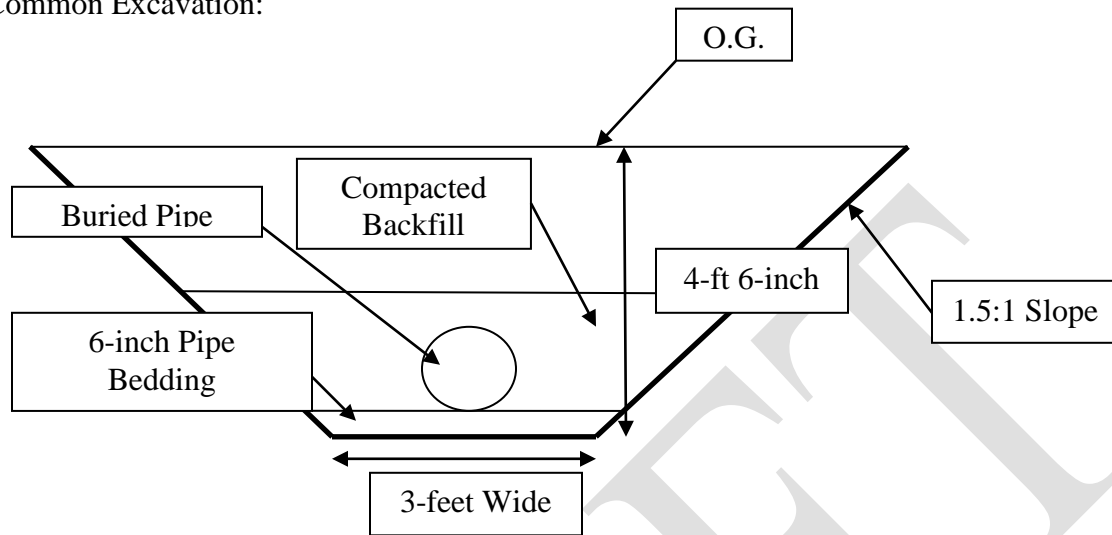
Common Excavation Trench Approximate Dimensions(NTS).
